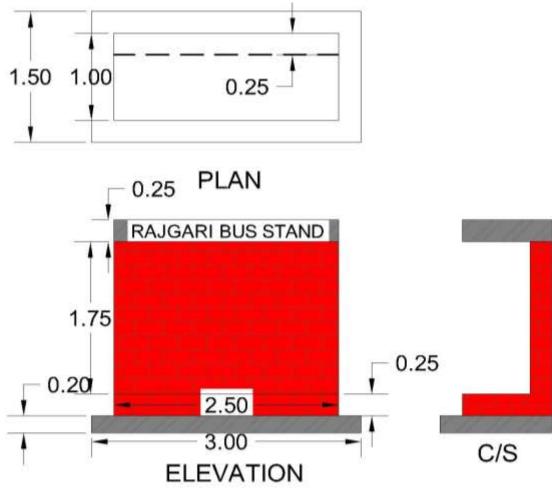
Plan, Elevation and Cross Section of Bus Stand
